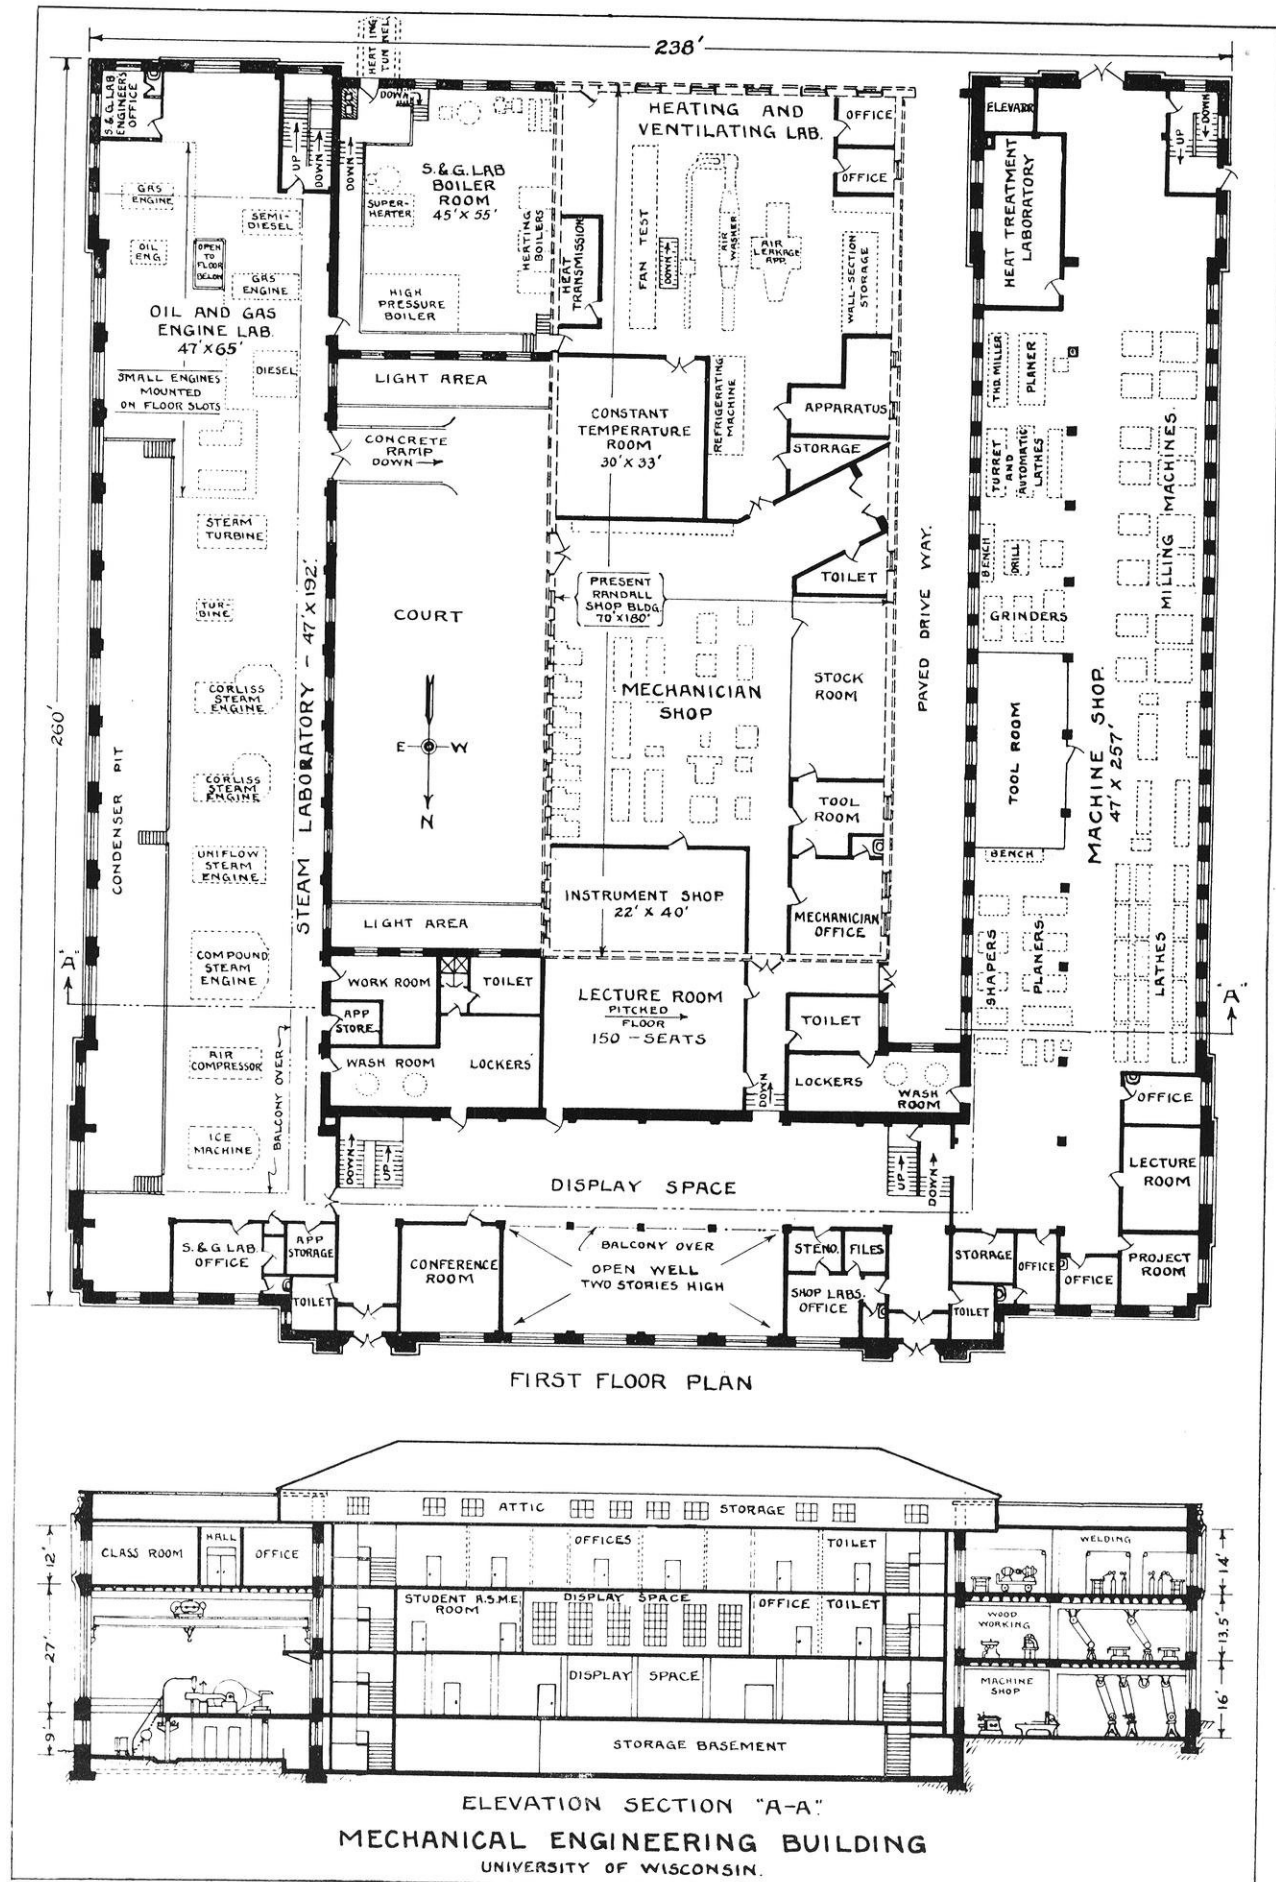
Floor plan and cross-section of new Mechanical Engineering Building.
